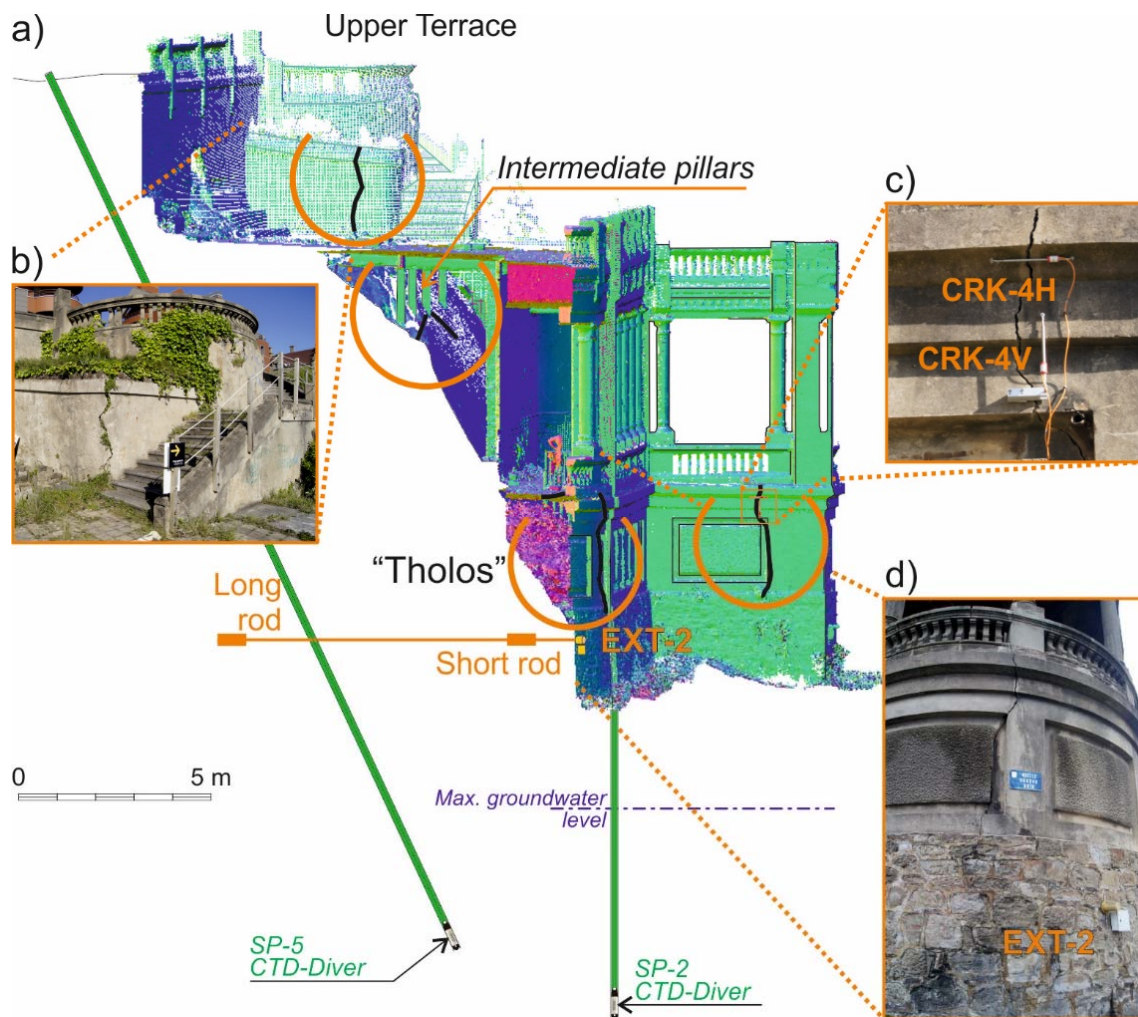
(a) Schematic cross-section of the Point Cloud of the Punta Begoña Galleries in the “Tholos” and Southwest Gallery (b) and (c) images of the main cracks in the section where the gallery widens (d) main crack in the “Tholos” façade.
